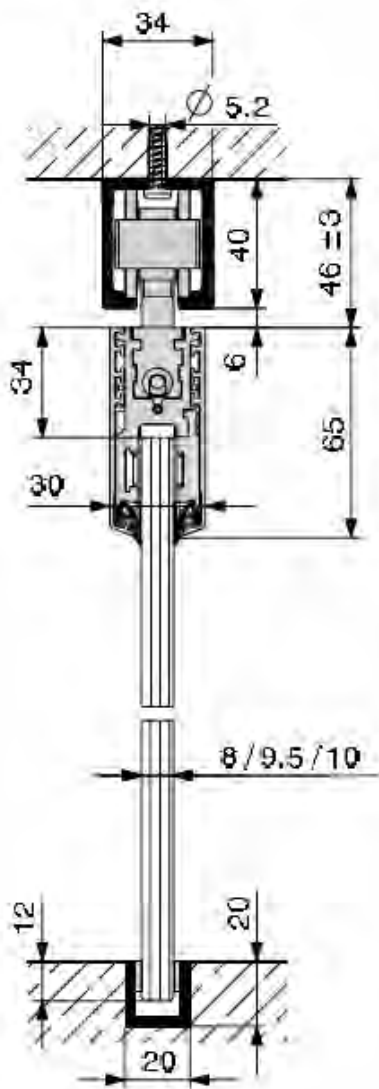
HAWA Junior 80/GL all glass sliding door system. Vertical section
